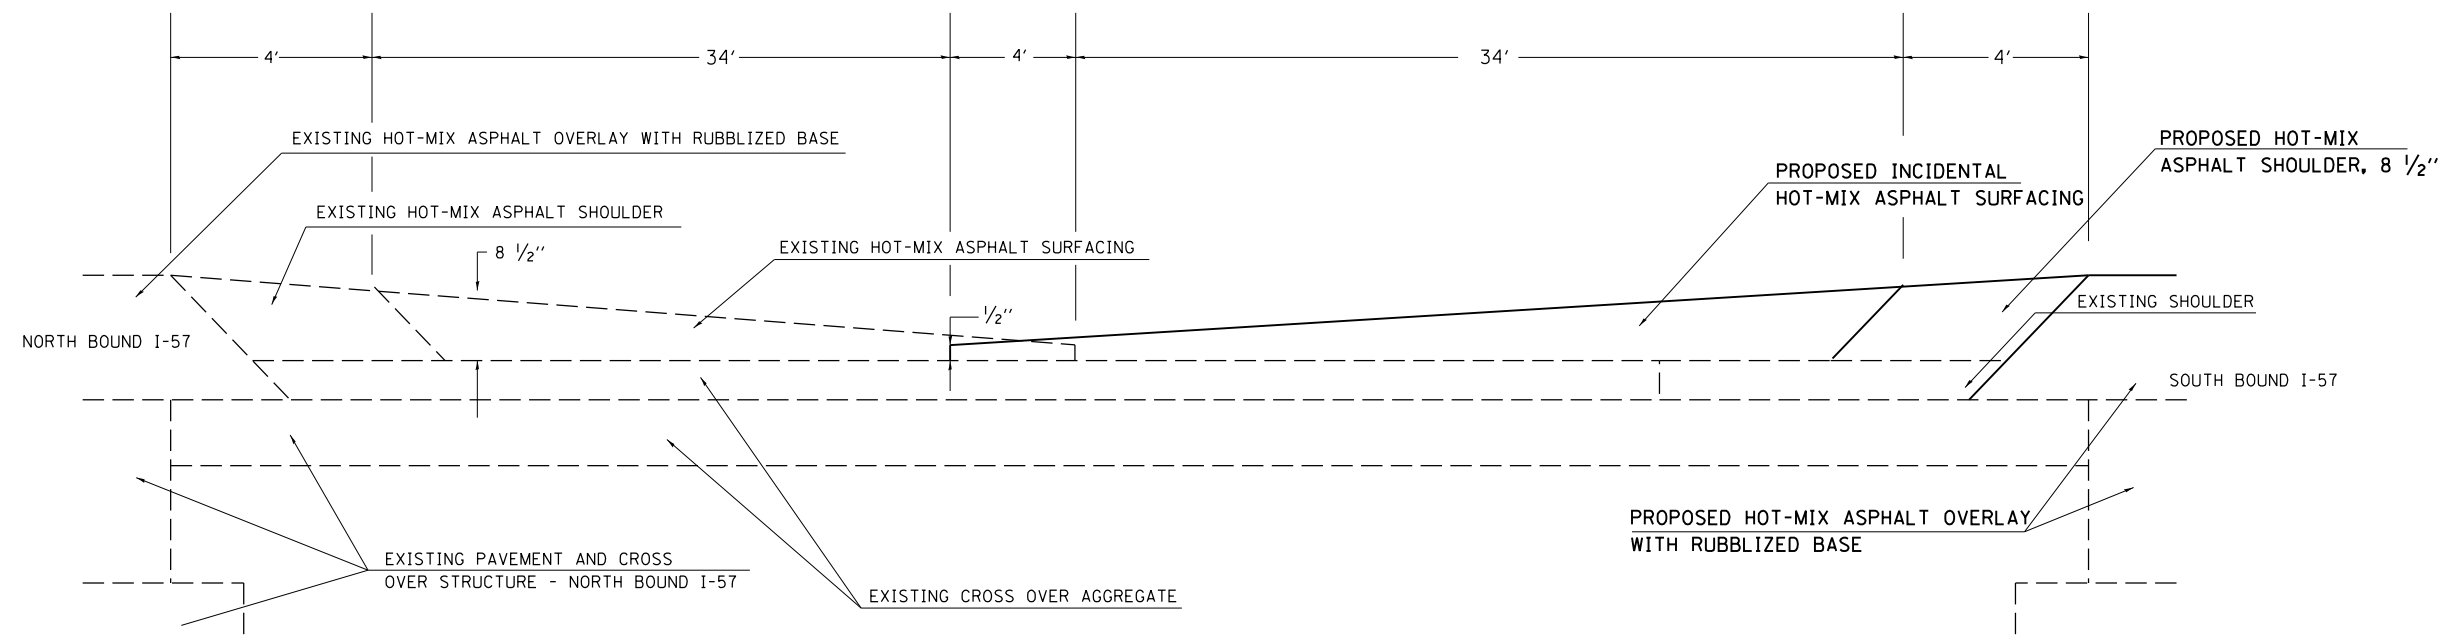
## DETAIL OF MEDIAN CROSSOVER PLAN VIEW
